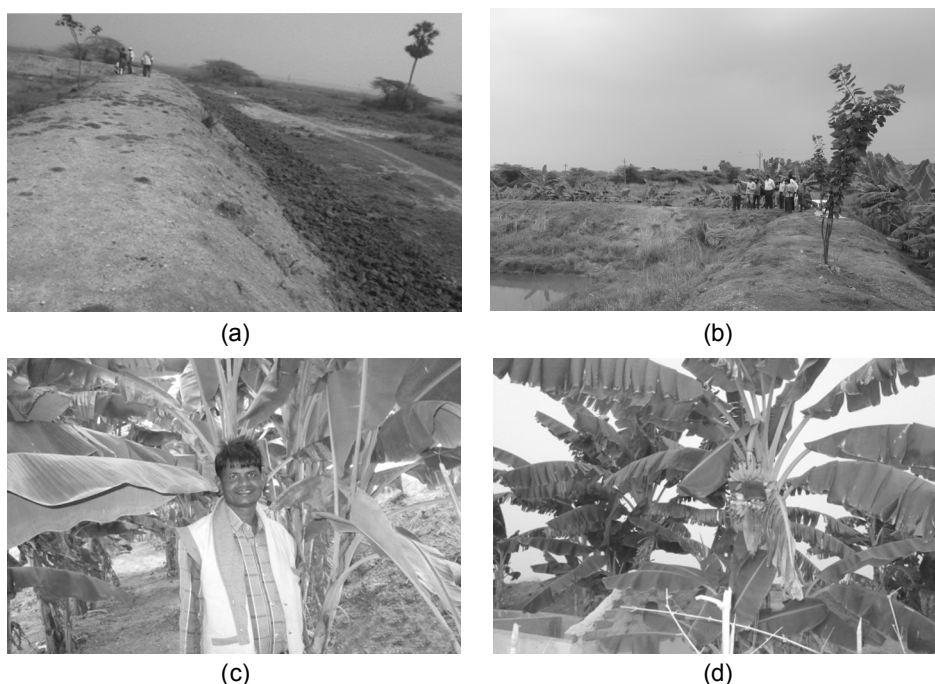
Bund area utilization (a, b) with construction of a basement around the pond, where banana plantation (c, d) is undertaken in two rows.
